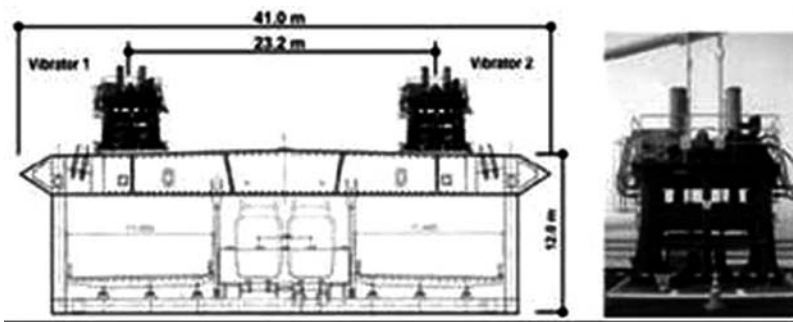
View of the vibrators installed on Youngjong bridge for field loading test.
